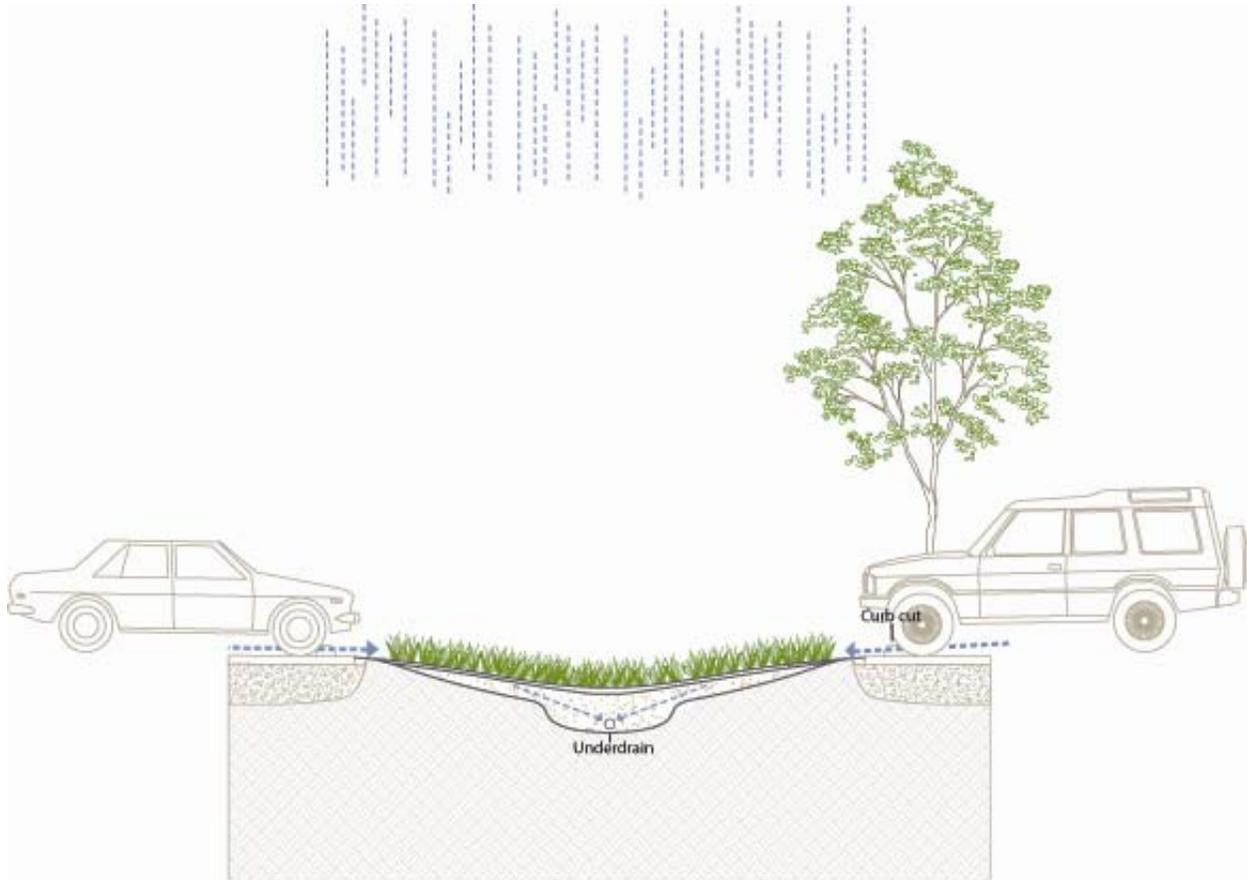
Enhanced swale diagram with underdrain system in parking lot.
